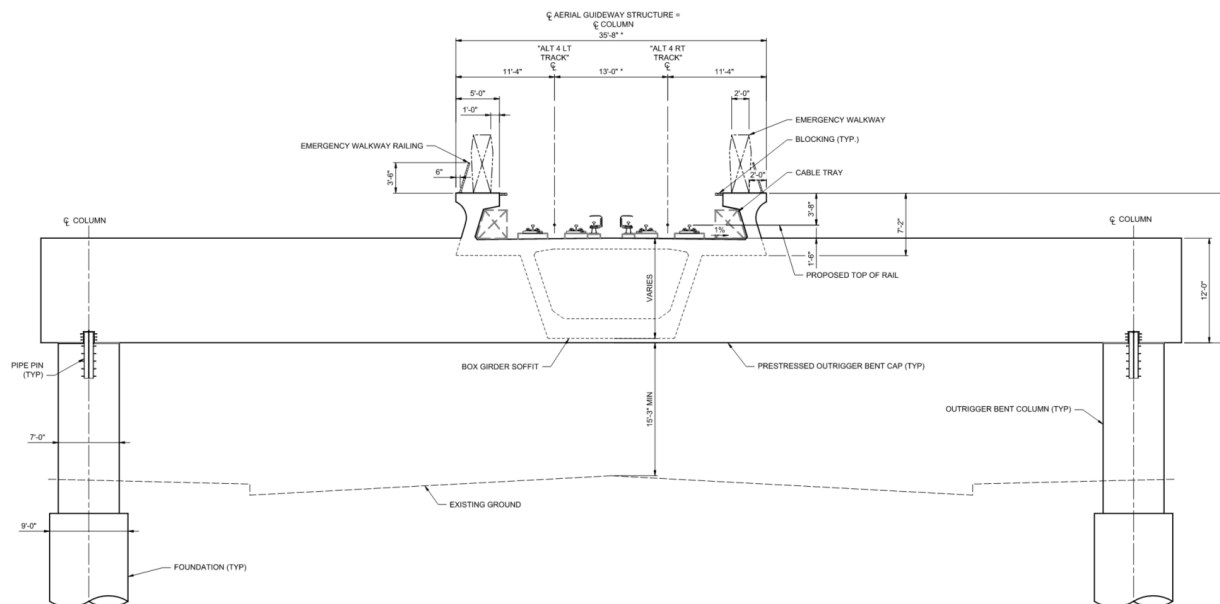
Typical Aerial Guideway Cross-Section
